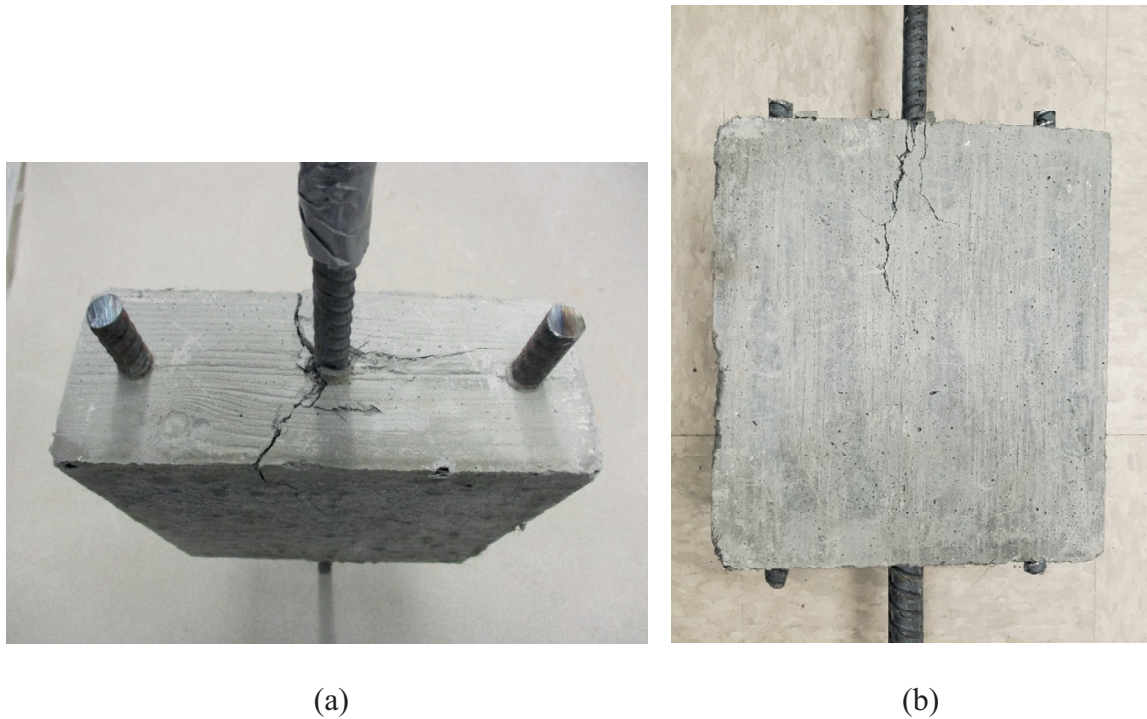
Rebar Pullout Test Splitting Failure Mode; (a) splitting cracking failure at #4 bar and (b) No failure at #6 bar.
